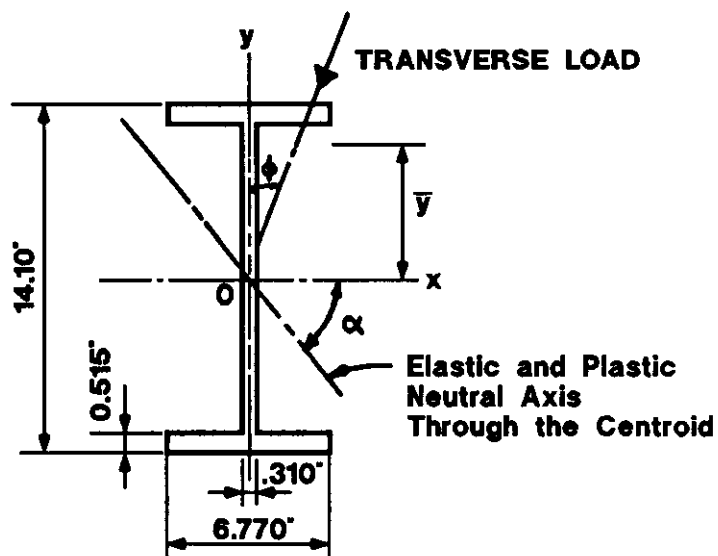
A-8(b) Loading on beam section, Example 5A-8(b)
